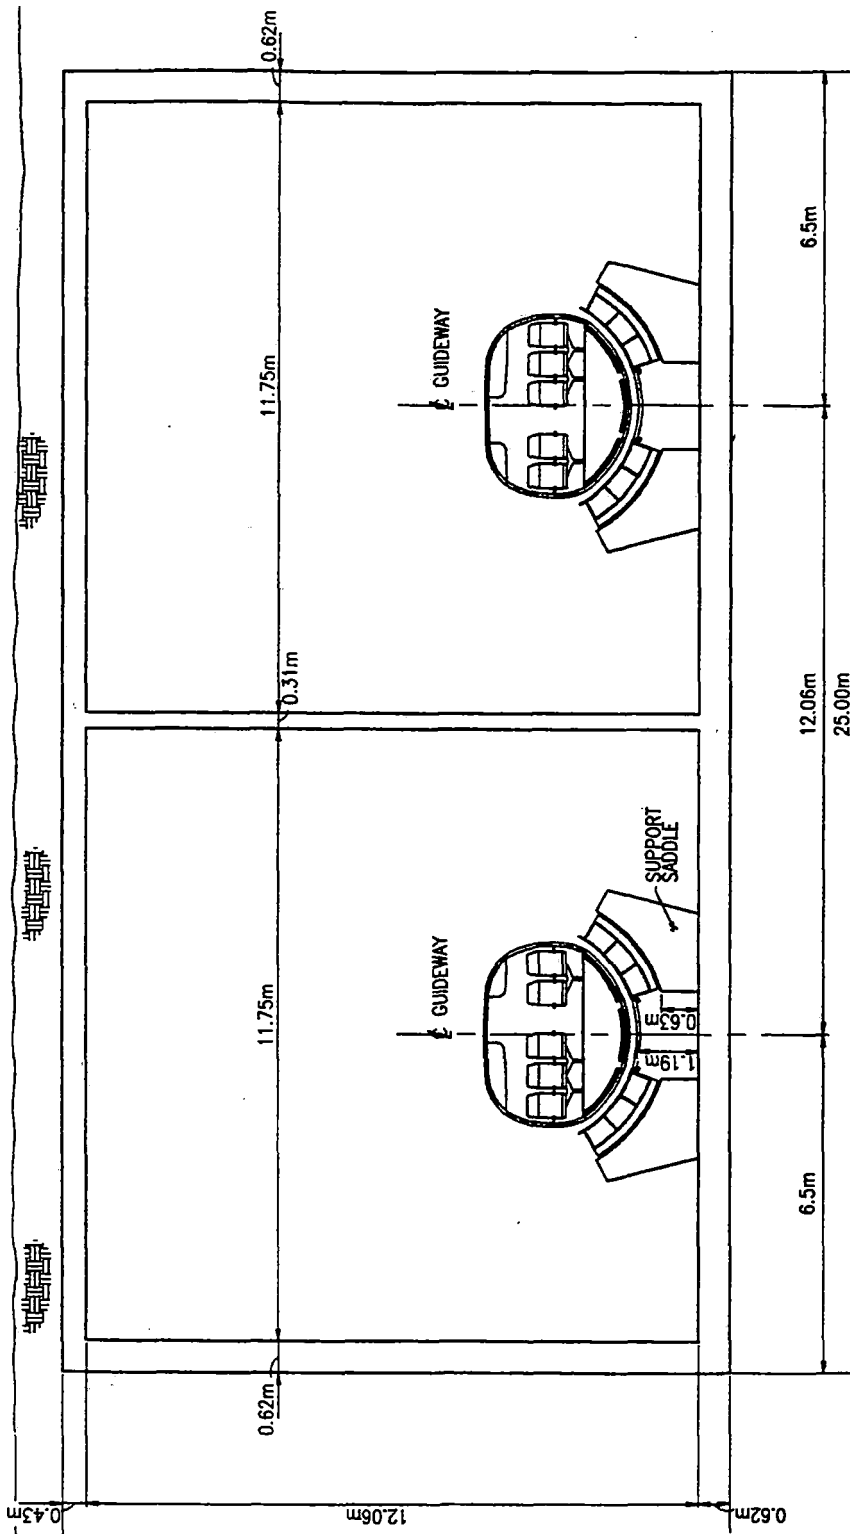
Cut and fill tunnel - 12 x 11.8 m
